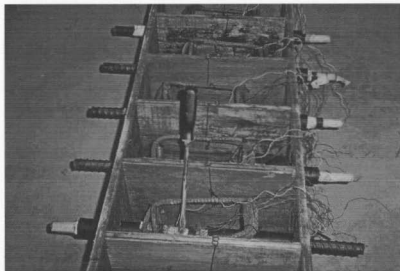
Concrete strain gauges glued around rebar prior to casting
